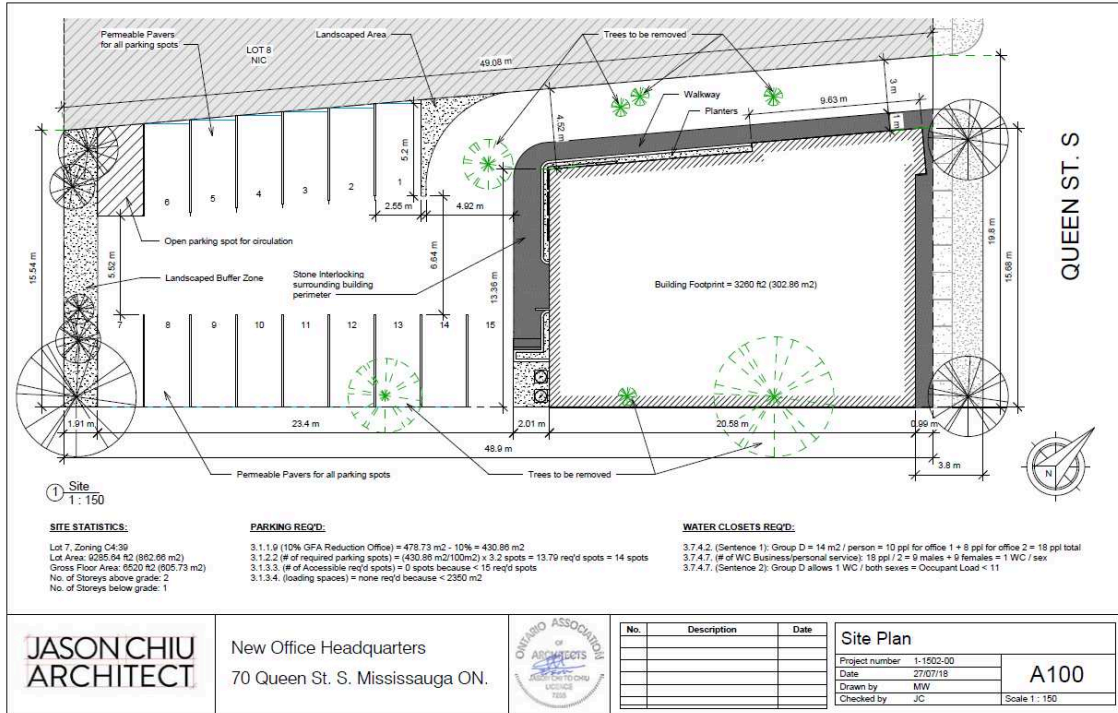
The new structure and its landscape as proposed for 70 Queen Street South. (Image from Alpha Prosperity Inc. 2018.)
